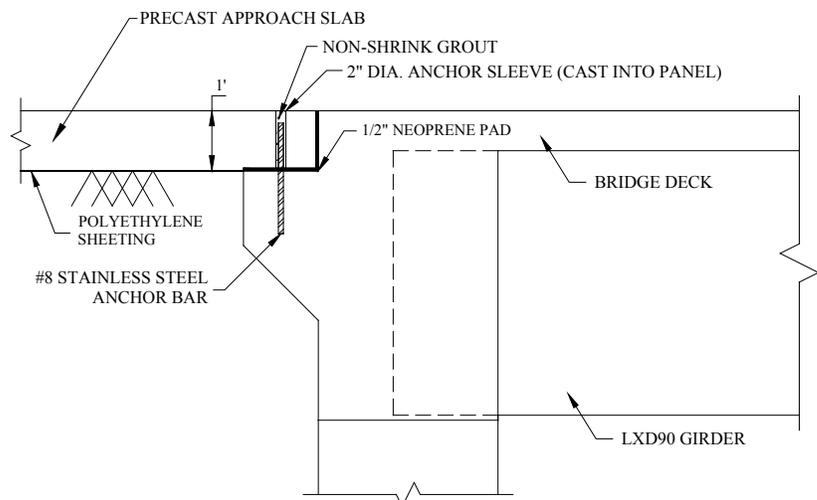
Connection detail for the precast approach slab to abutment, northbound
